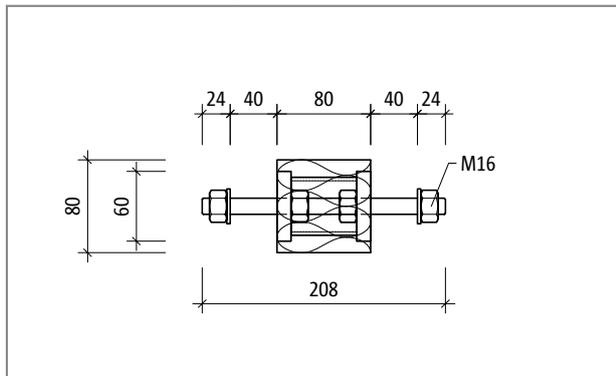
Schöck Isokorb® T type S-V-D16: Cross-section
